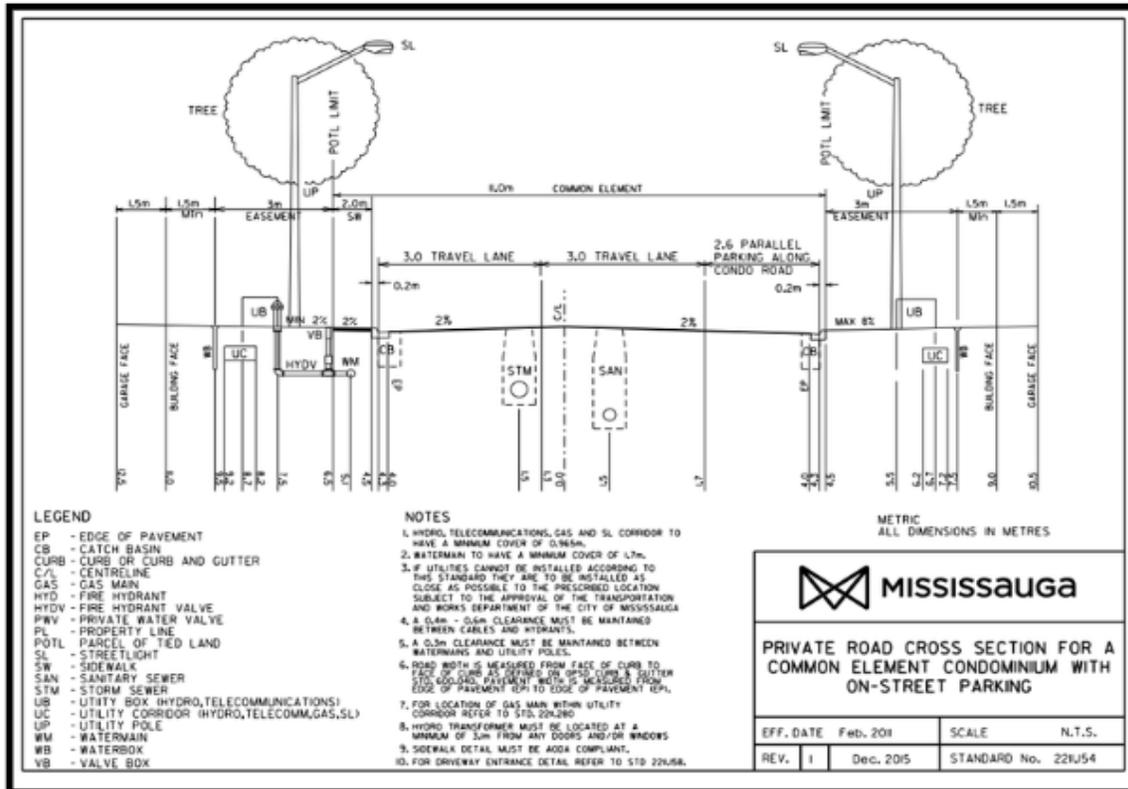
Example of City of Mississauga condominium road standard with on-street parking
